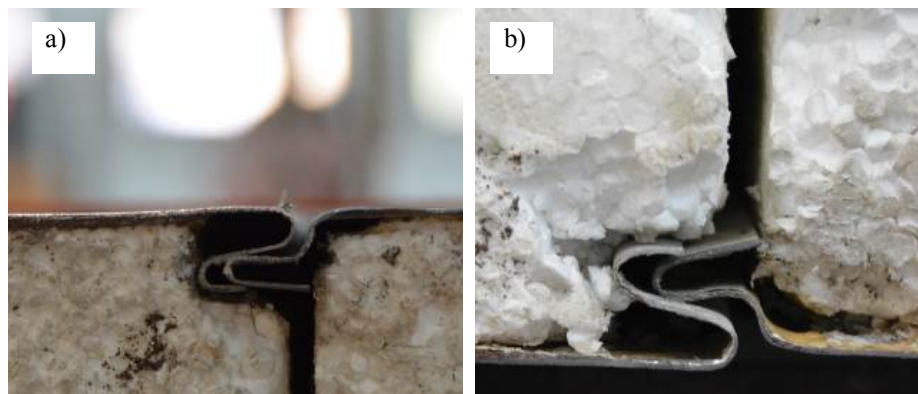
View of the concealed fixing joint: a) external facing during experiment, b) removed panel
